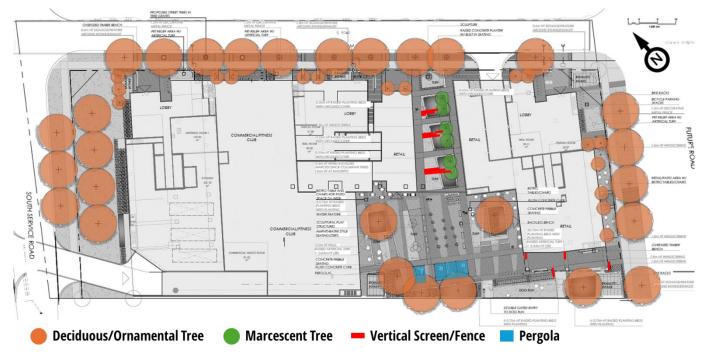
Original Landscape Plan (2023-10-05), Courtesy of Adesso Design Inc.
